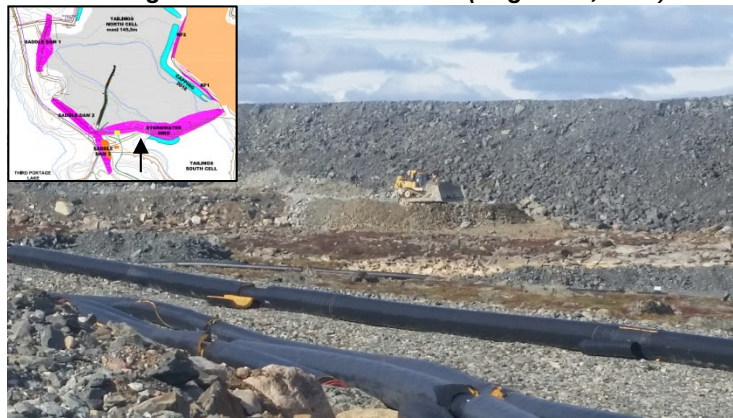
Dozer building the access road to the buttress construction area (September 4, 2016).
